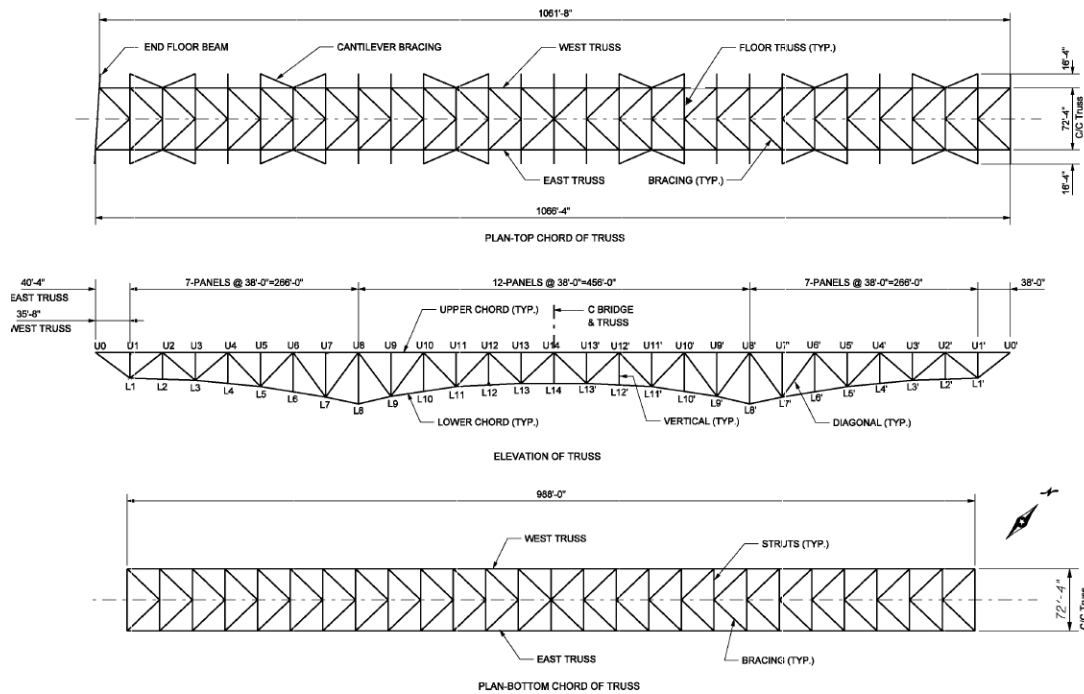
Plan View of Lower Lateral and Upper Lateral System
